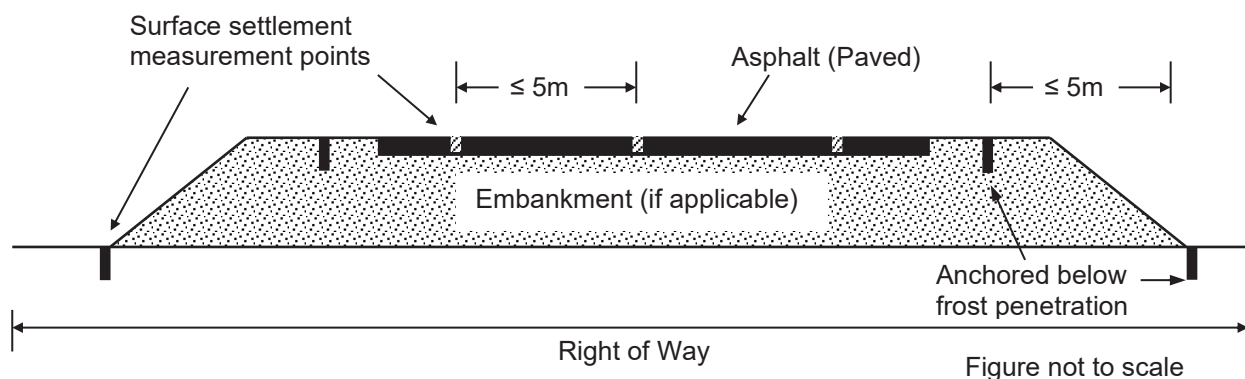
Typical configuration of surface settlement monitoring points along the tunnel alignment.
